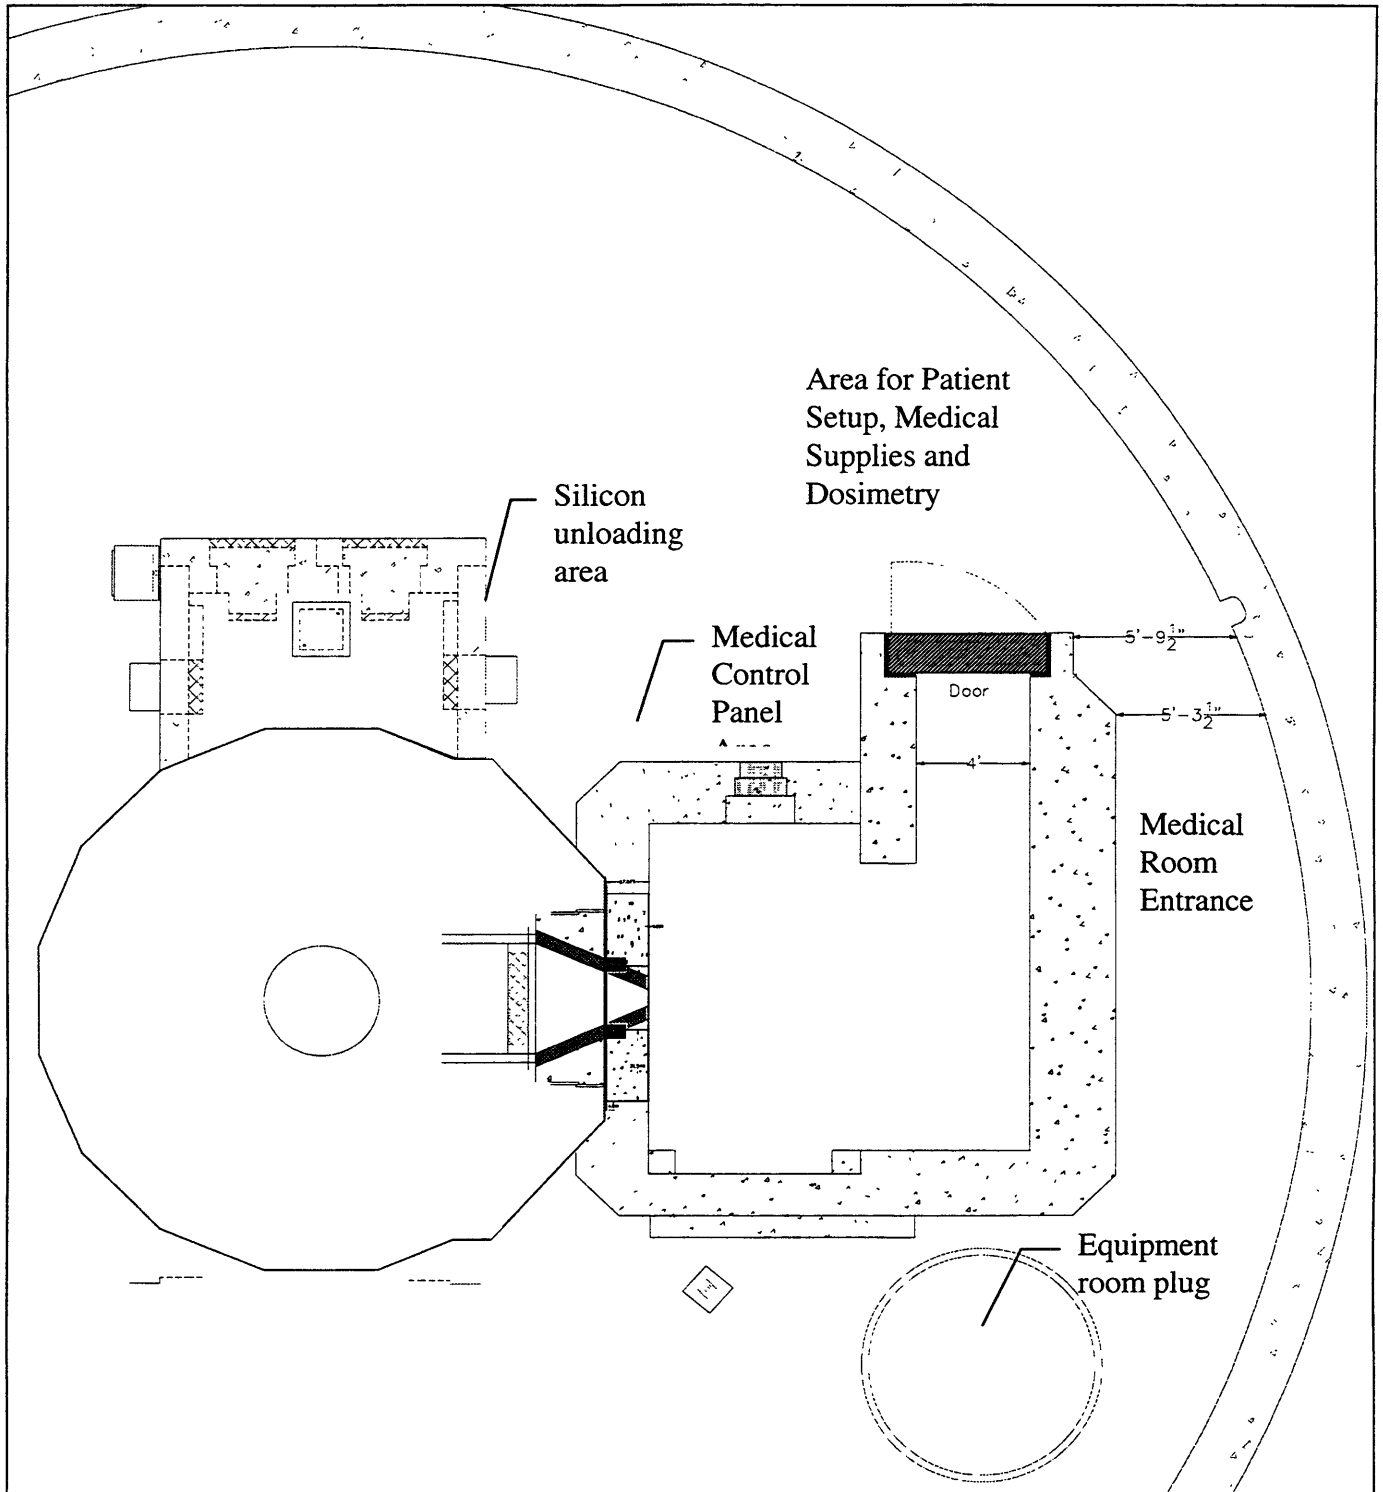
Layout of room showing the location for the shielded door in the reactor building.
